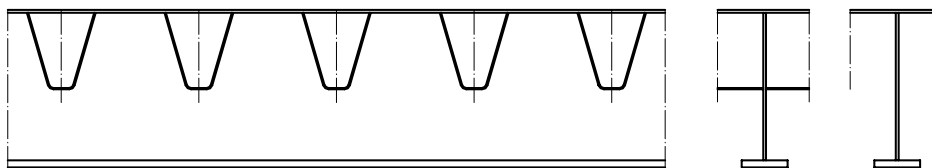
shows the crossbeam type “CC”, with the trough stiffeners fitted between the crossbeams.
